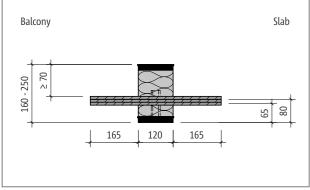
Schöck Isokorb® XT type H-NN2: Product plan view
